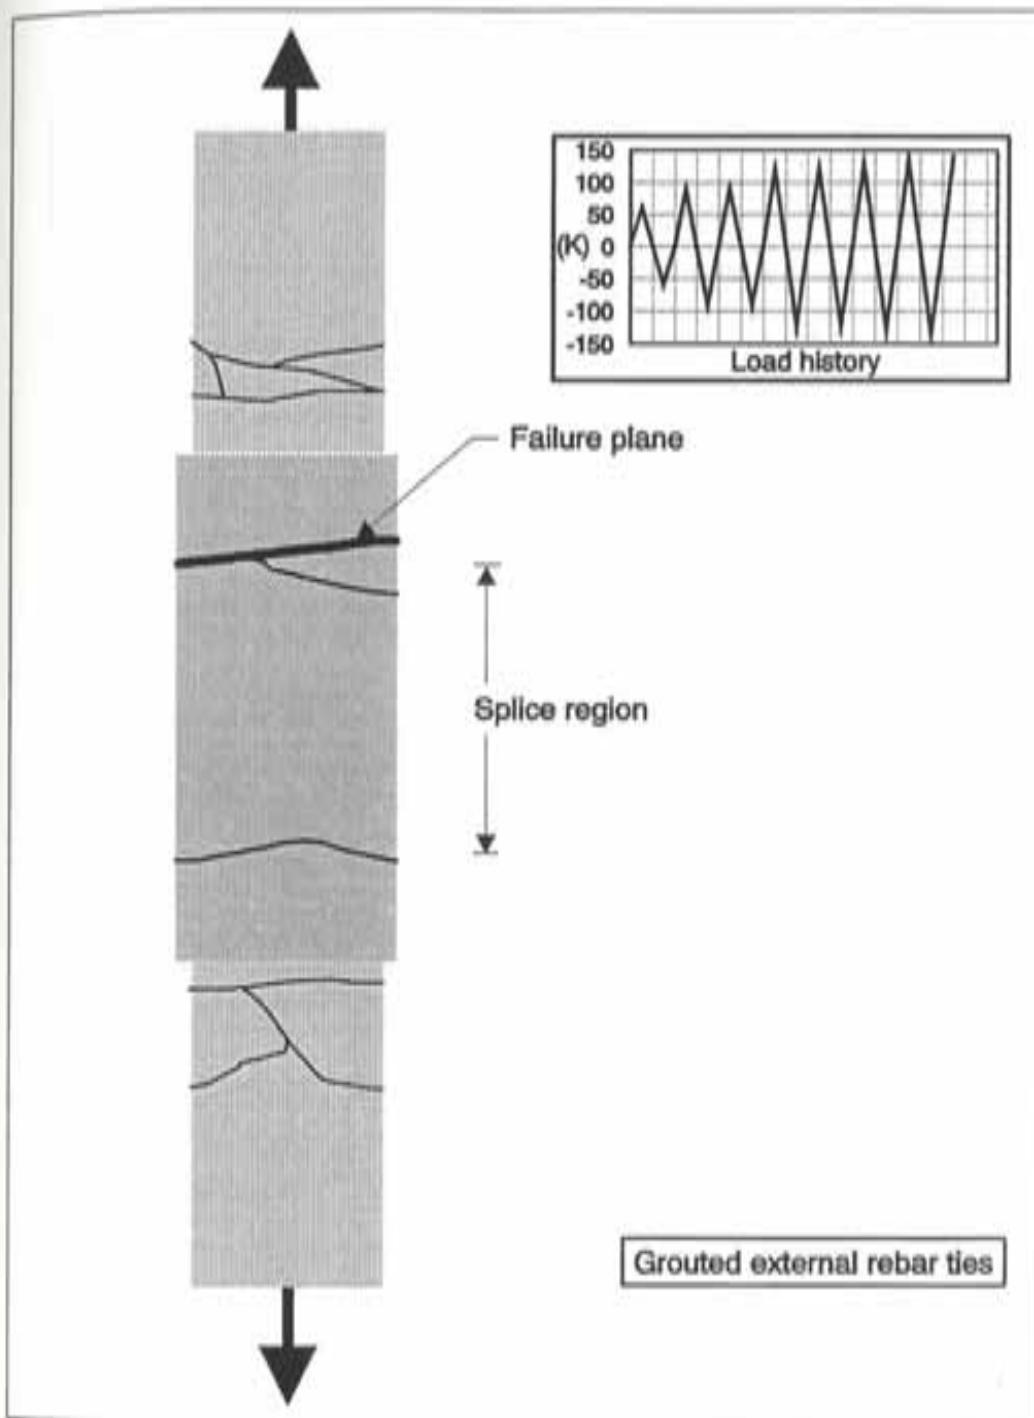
Crack pattern in specimen U-ES3-G-1 at failure
